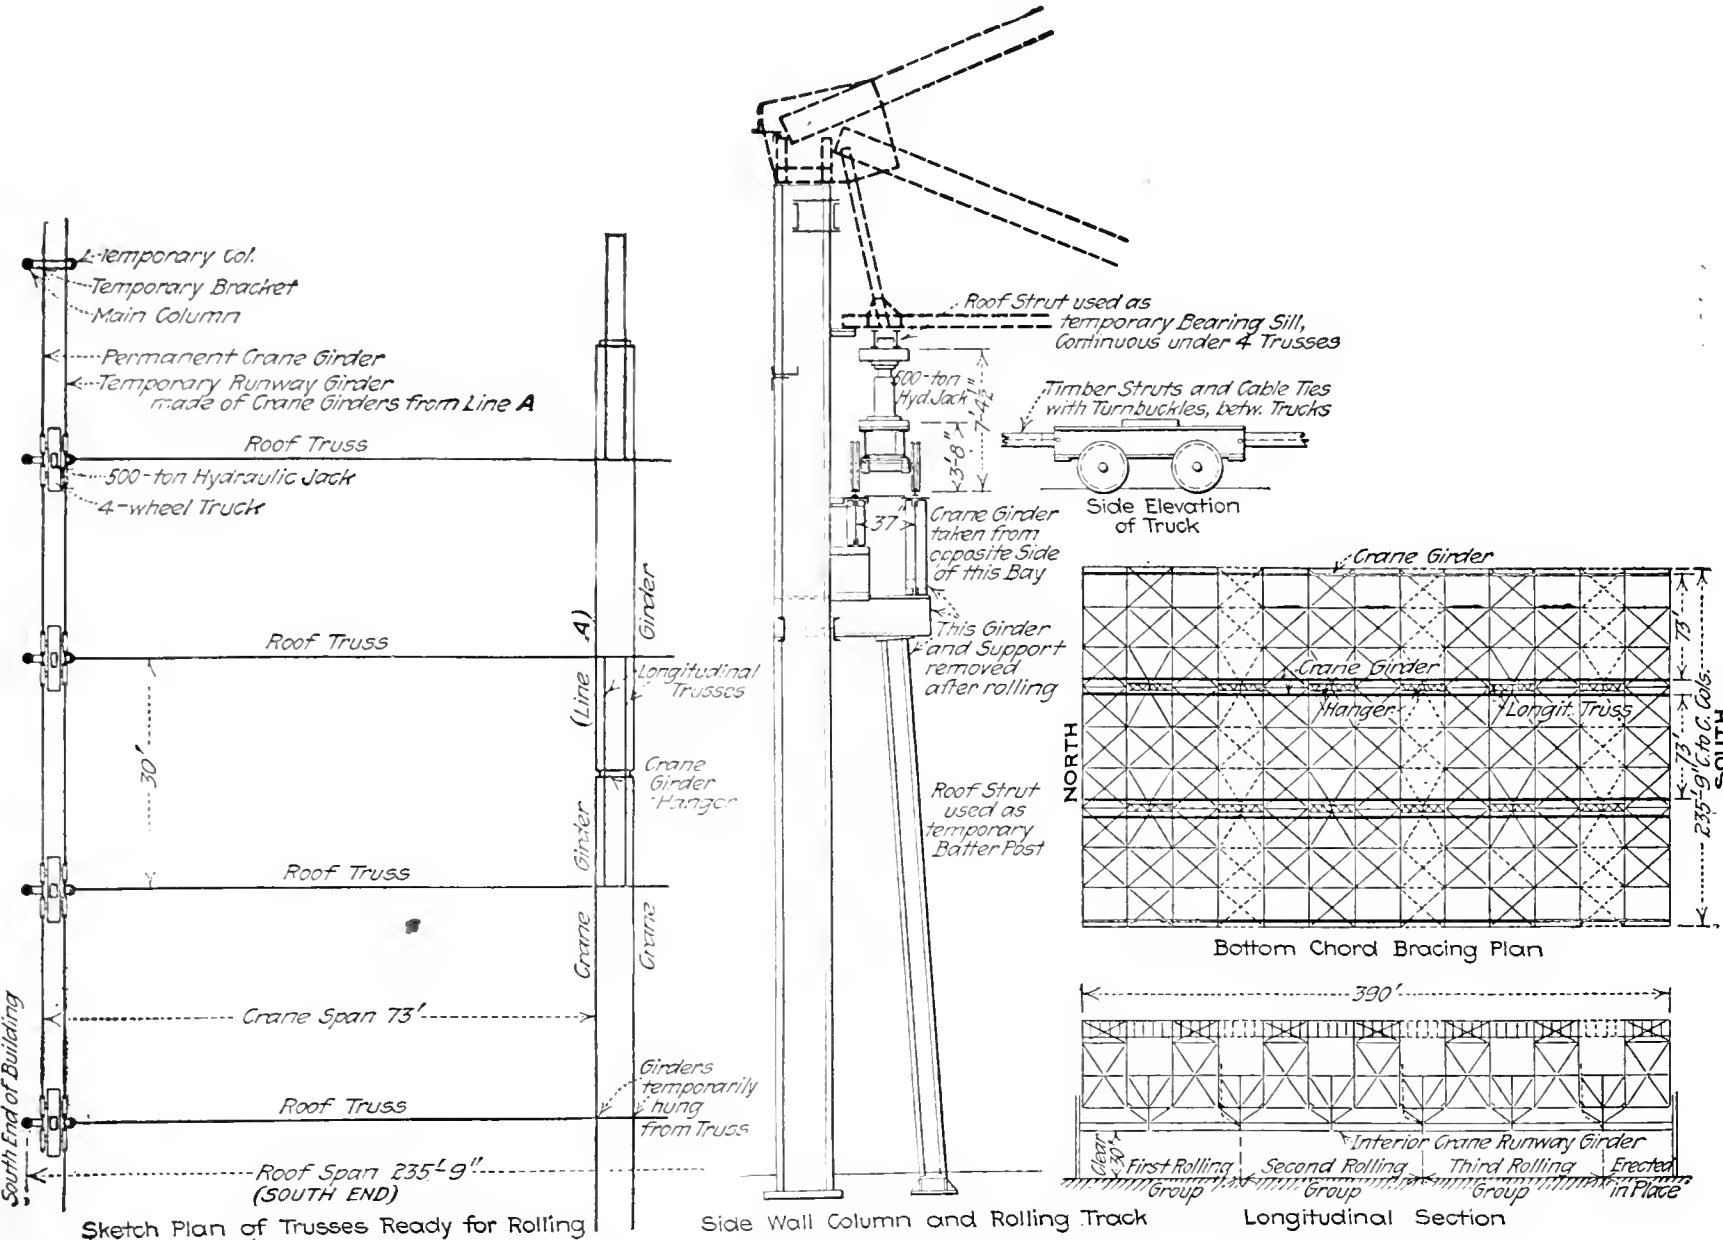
UTILIZING COLUMNS AND CRANE GIRDERS TO FORM ROLLING TRACK FOR TRUSSES
